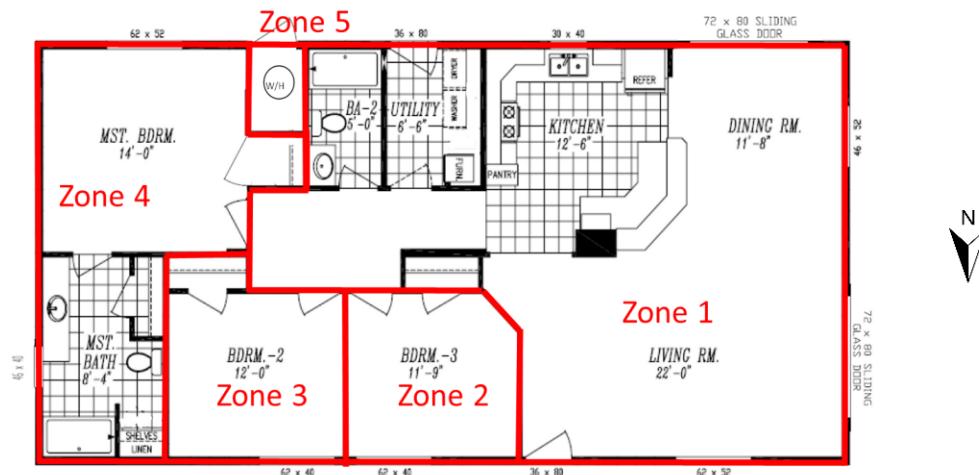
Lab Home floor plan and thermal zoning in the EnergyPlus model.
